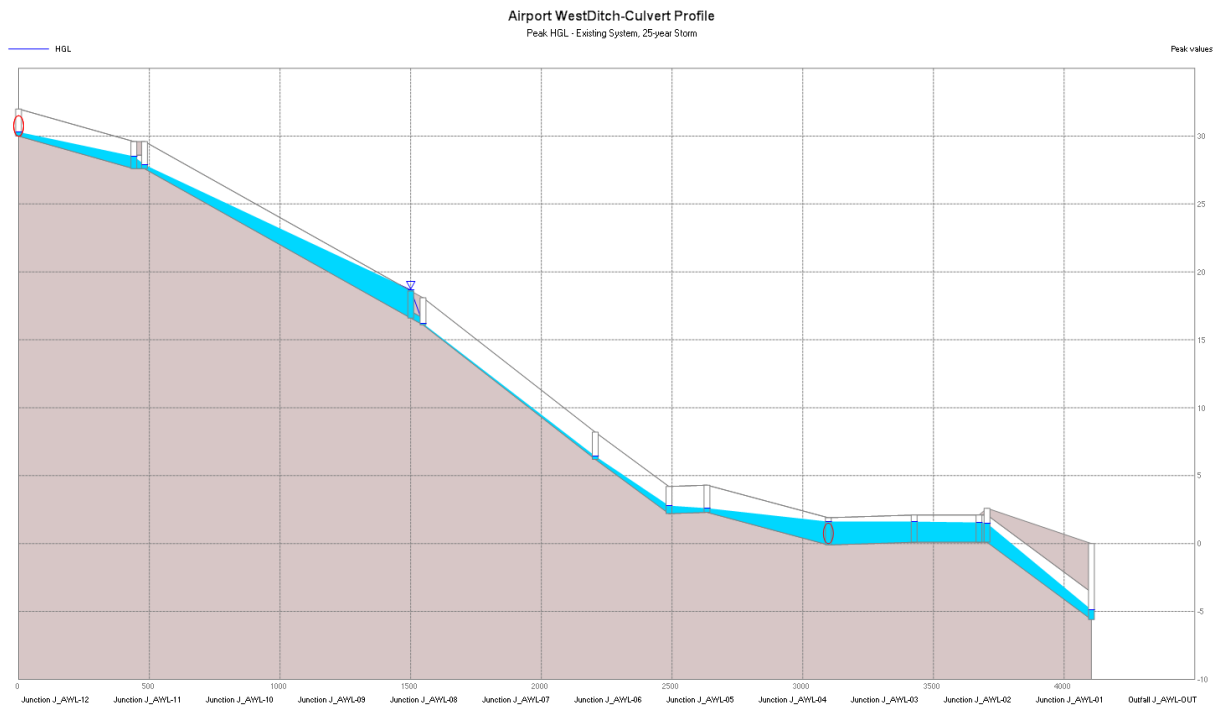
Airport West Ditch & Culvert System Profile – Existing Conditions
